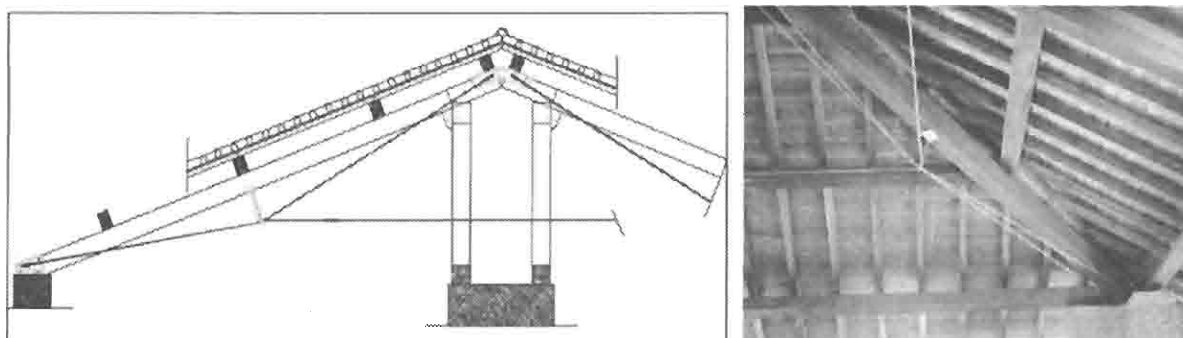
a) scheme of stainless steel cables ; b) View of the rafter with the telescopic struts and the steel cable consolidation.
